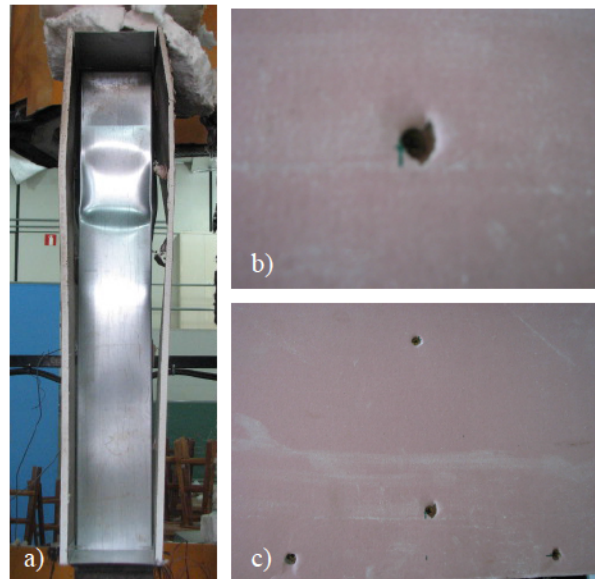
Fastener pull-through failure during compression test of sheathed stud at elevated temperature, a) sheathed stud after test, and holes at b) mid-height and c) bottom connections due to fastener pull-through
